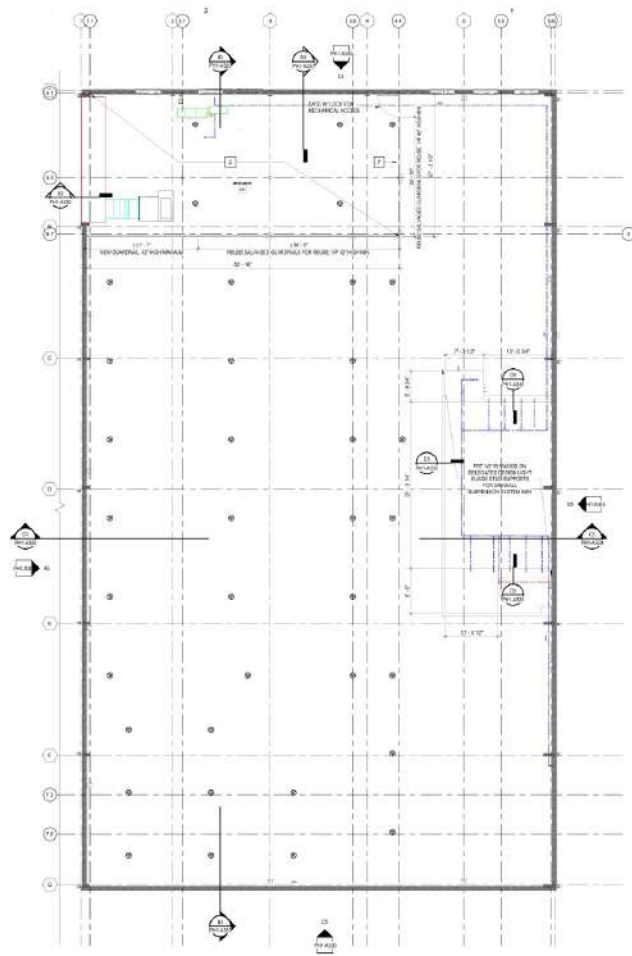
FLOOR PLAN - EXISTENTIAL/RE-USE
